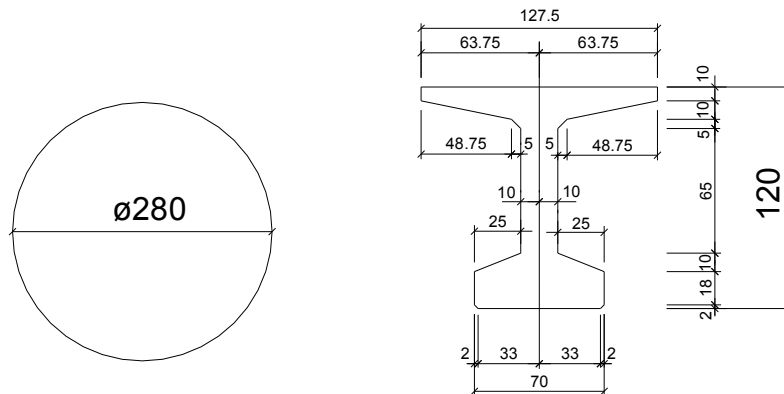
The Akcaova bridge- Cross sections of columns and girders
